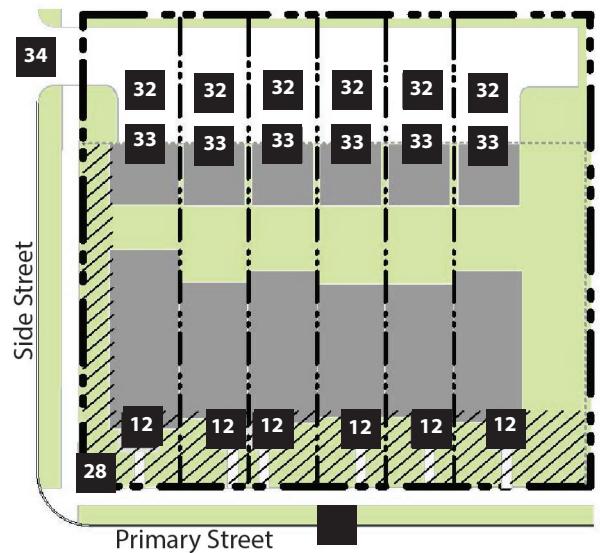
Row building siting diagram shown with detached garages and rear vehicular access. Not to scale.
